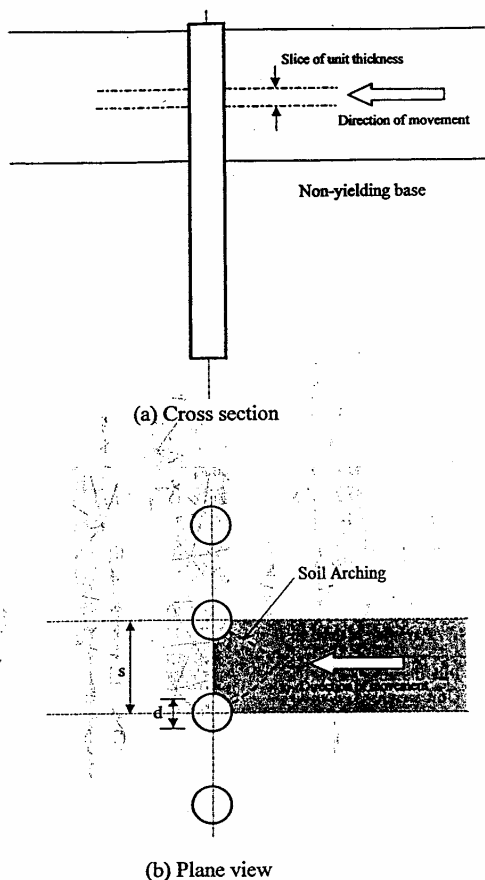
Drilled shafts in a row for stabilizing a deforming ground
